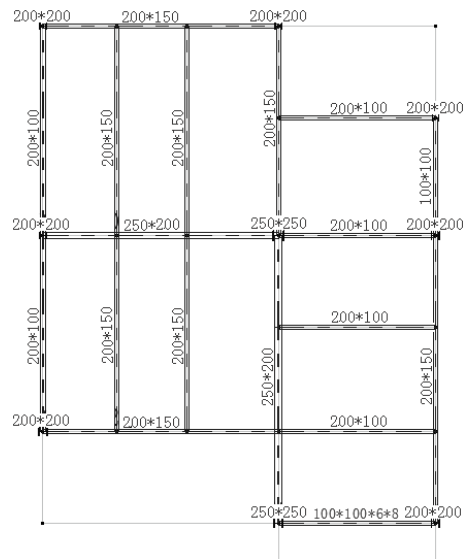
First floor beam and column layout of light-steel straw-bale structure
